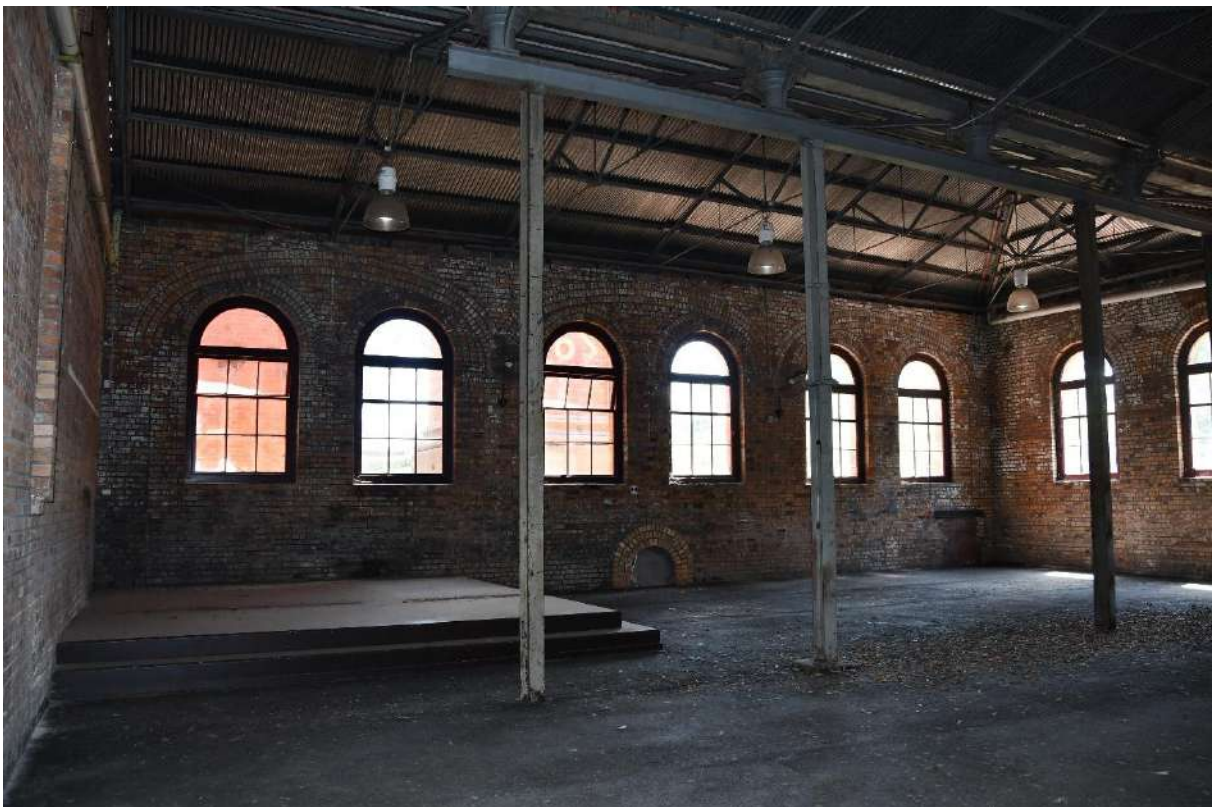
Internal Boiler Room (B) with replace Columns and ornate brickwork over windows
